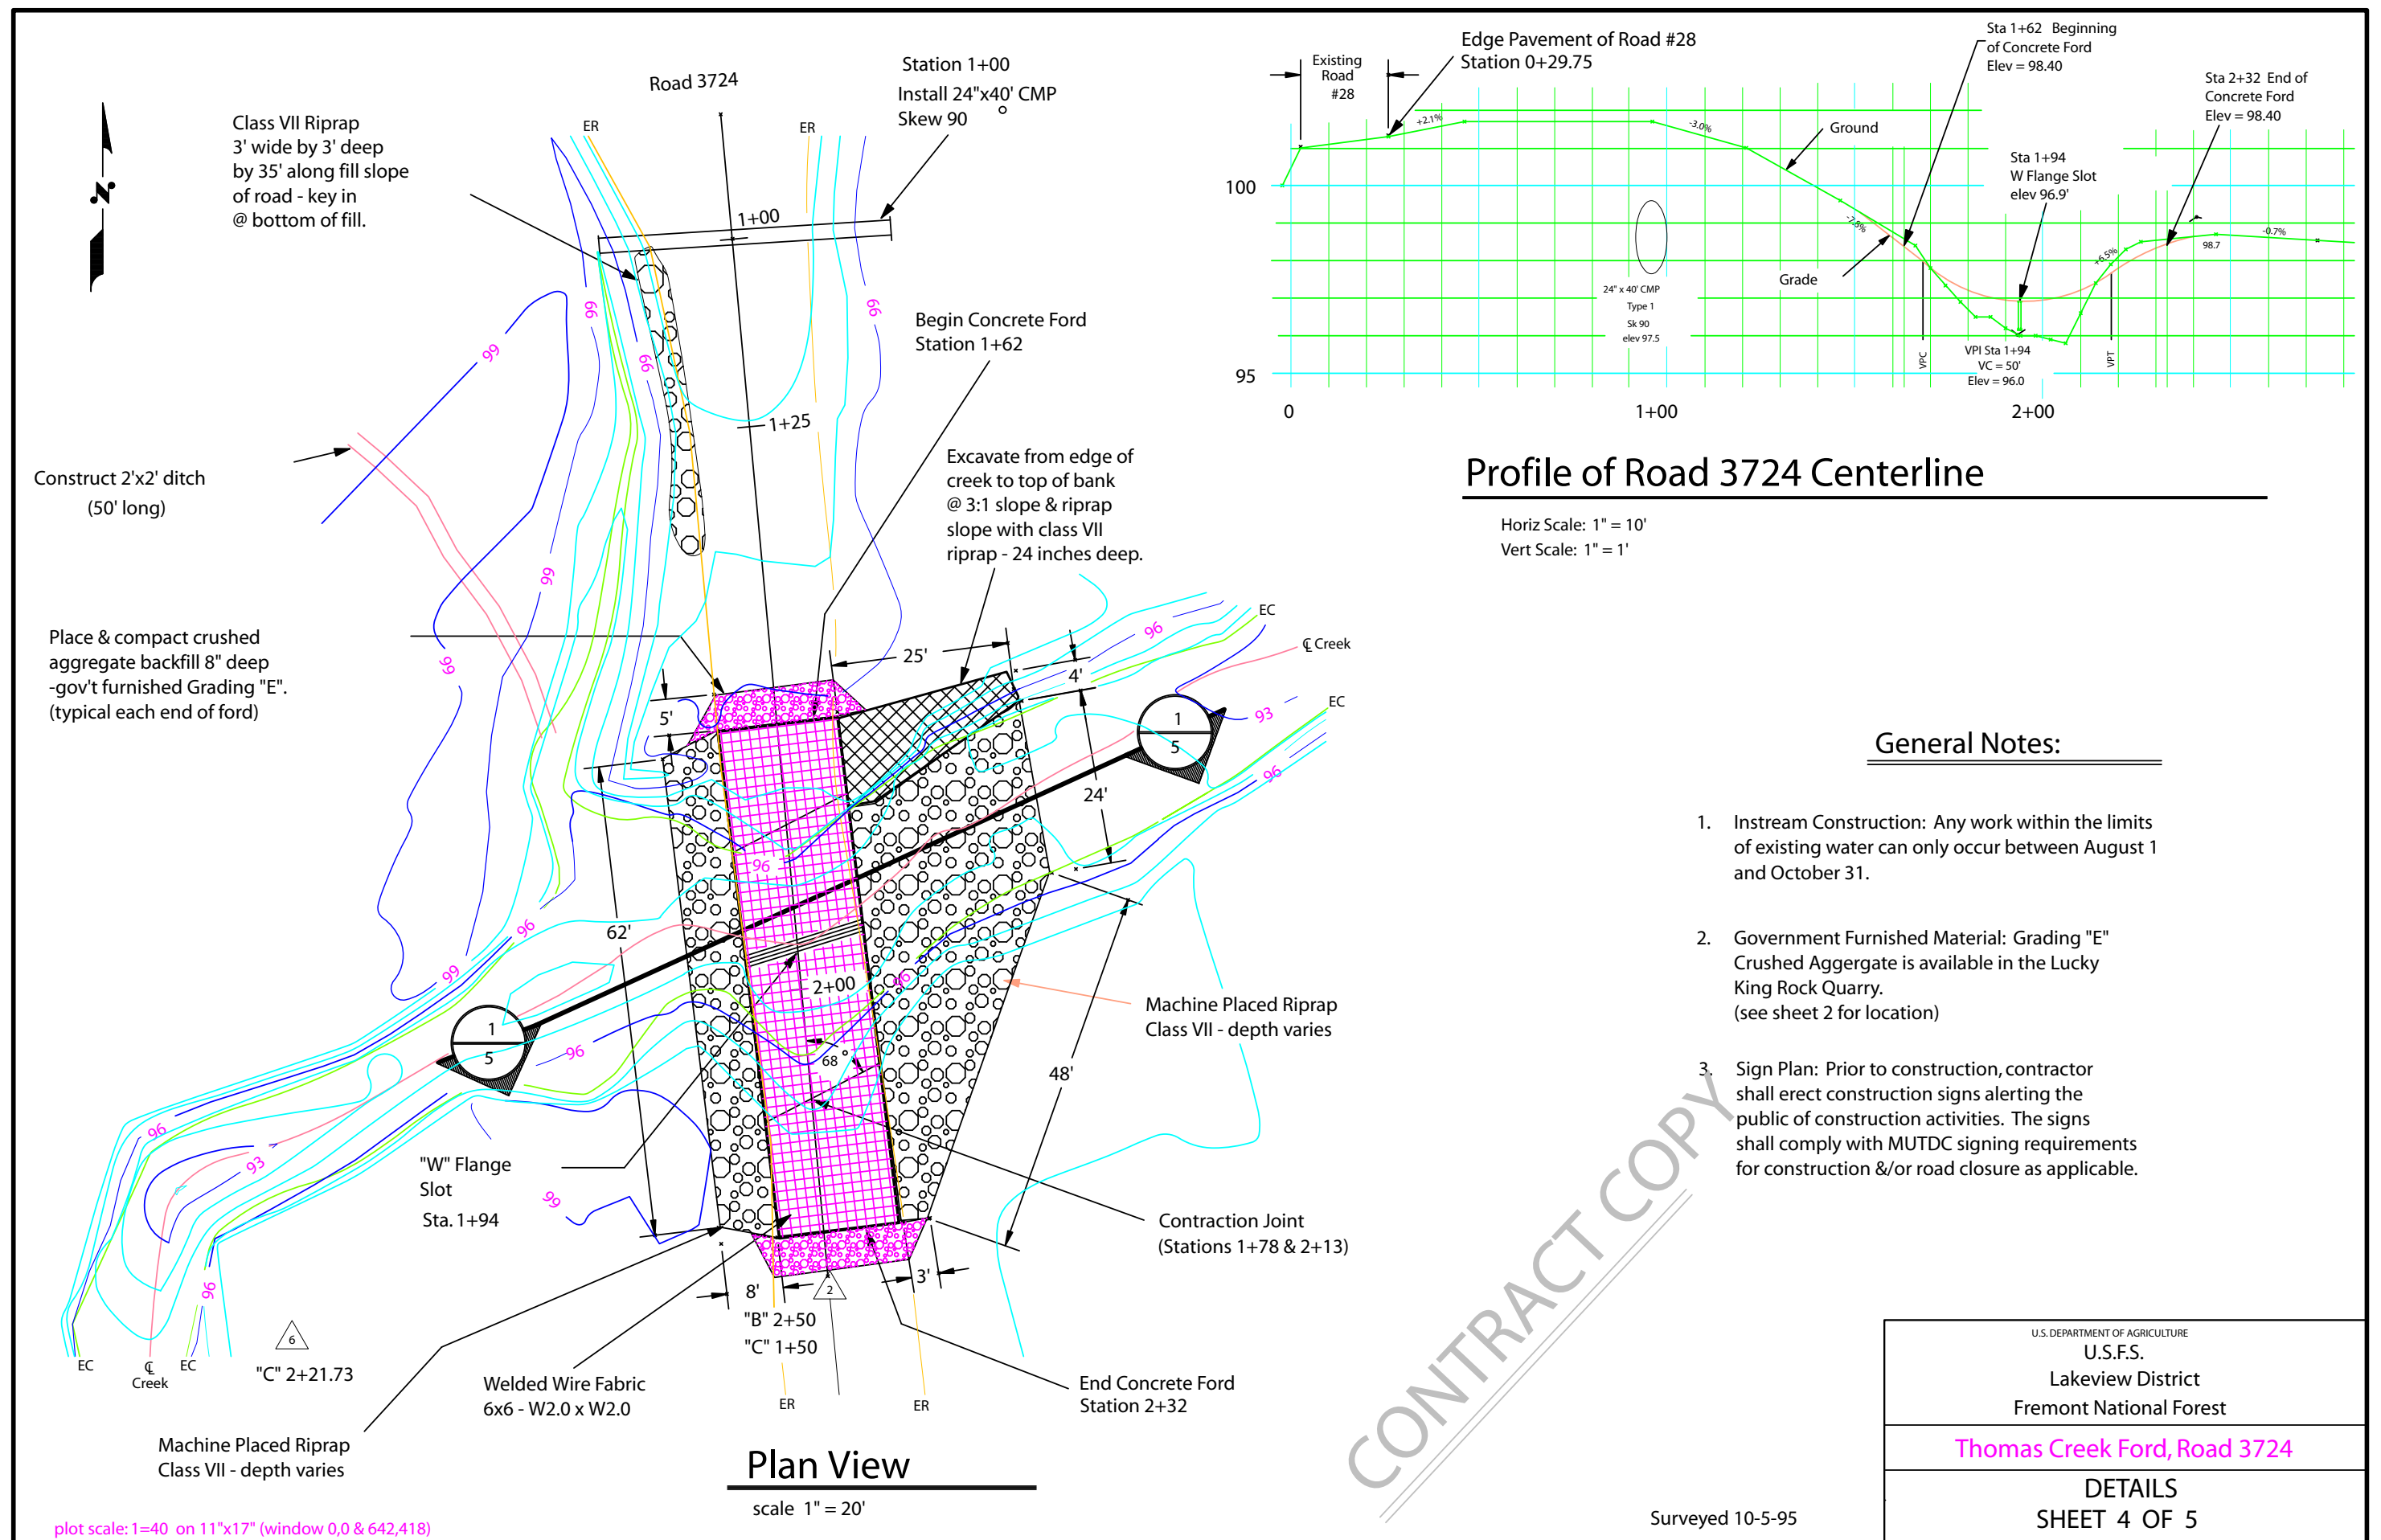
Thomas Creek ford contract drawings sheet 4: site plan view.
